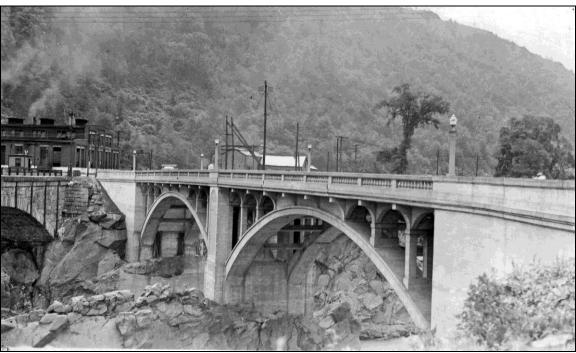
Vilas Bridge in 1941, upstream side. Note stone arch railroad bridge at left (NHDOT 1941).
